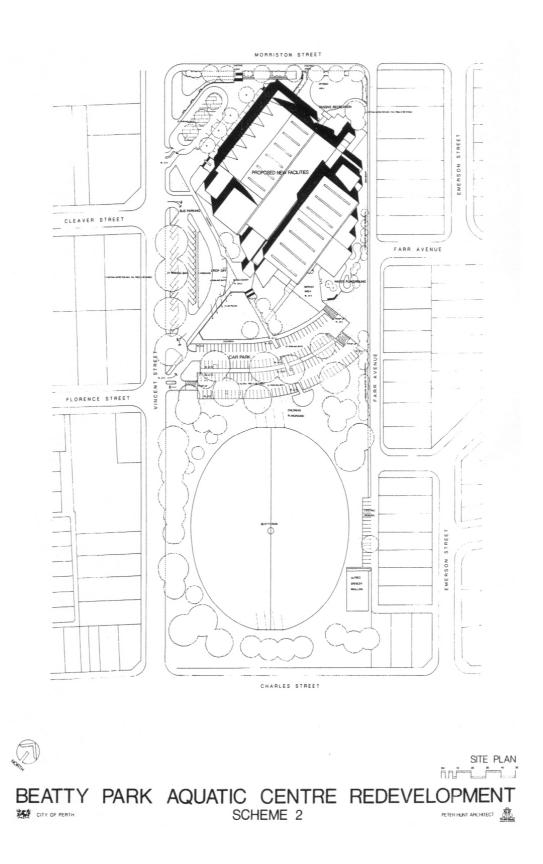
Site Plan – Scheme 2 showing the construction of entirely new facilities, Peter Hunt Architect Beatty Park Aquatic Centre Redevelopment for City of Perth, Appendix, 1993.
